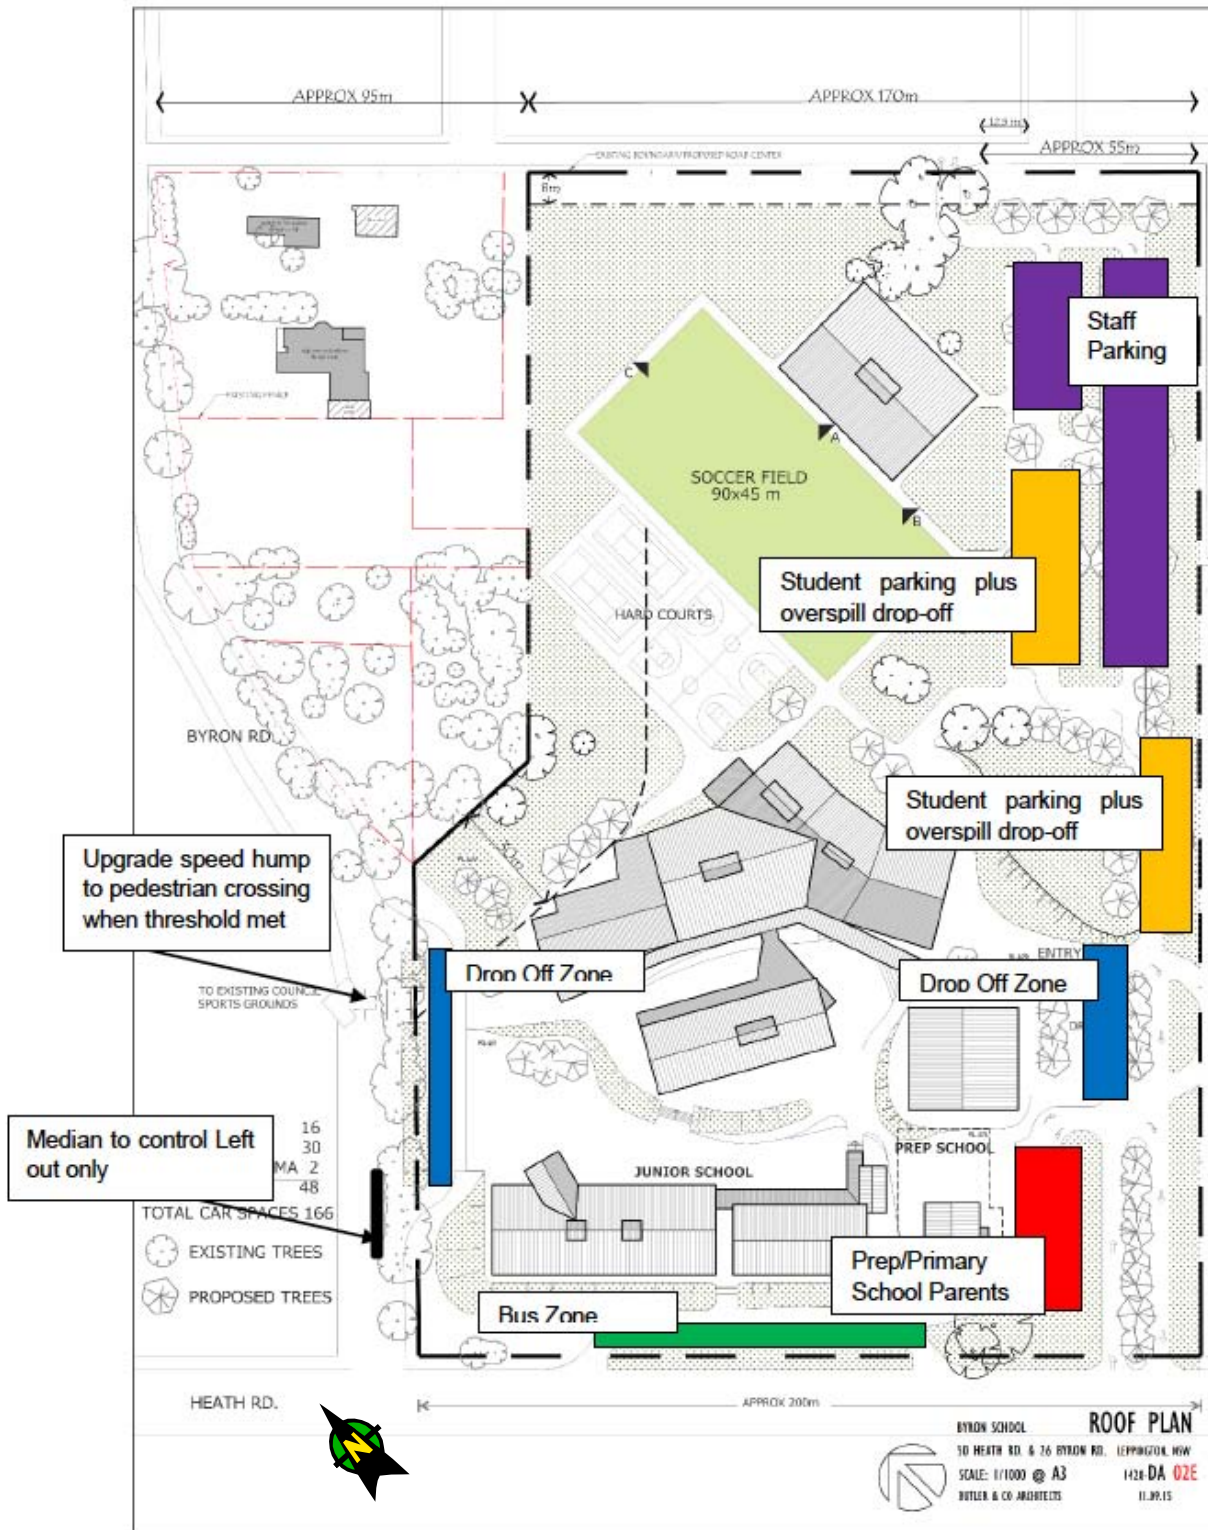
Car parking proposed concept master plan— concept approval only sought
